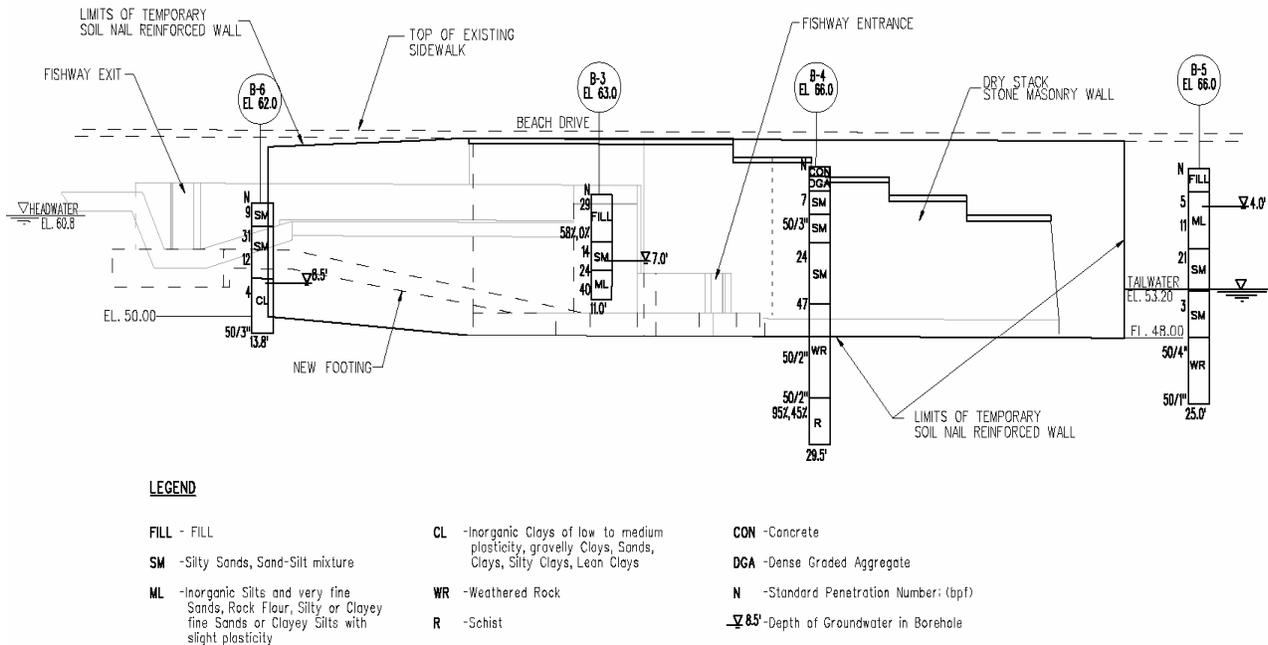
Profile of Soil Nailed Wall (KCI 2003)
